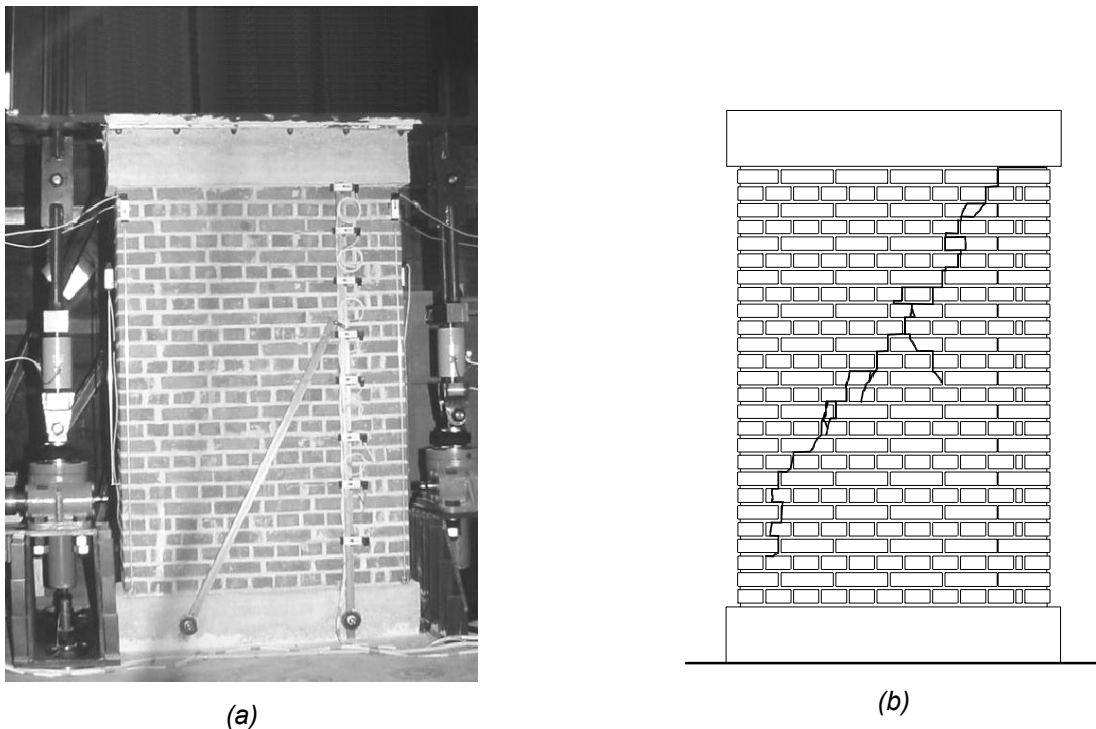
Masonry wall (a) and crack pattern (b)
